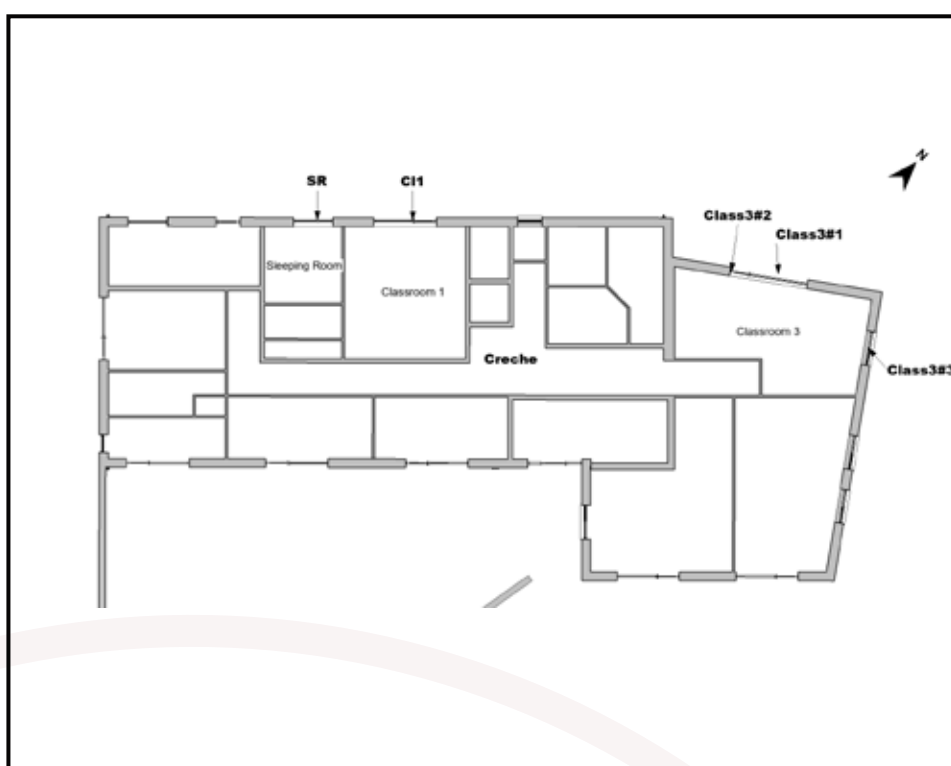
Floorplans with indication of the assessed windows/rooms Figure A.30: Floorplans with indication of the assessed windows/rooms
